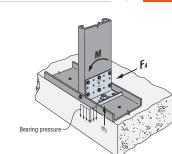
Figure A - Anchor Tension, T, Created from Moment (one anchor)
